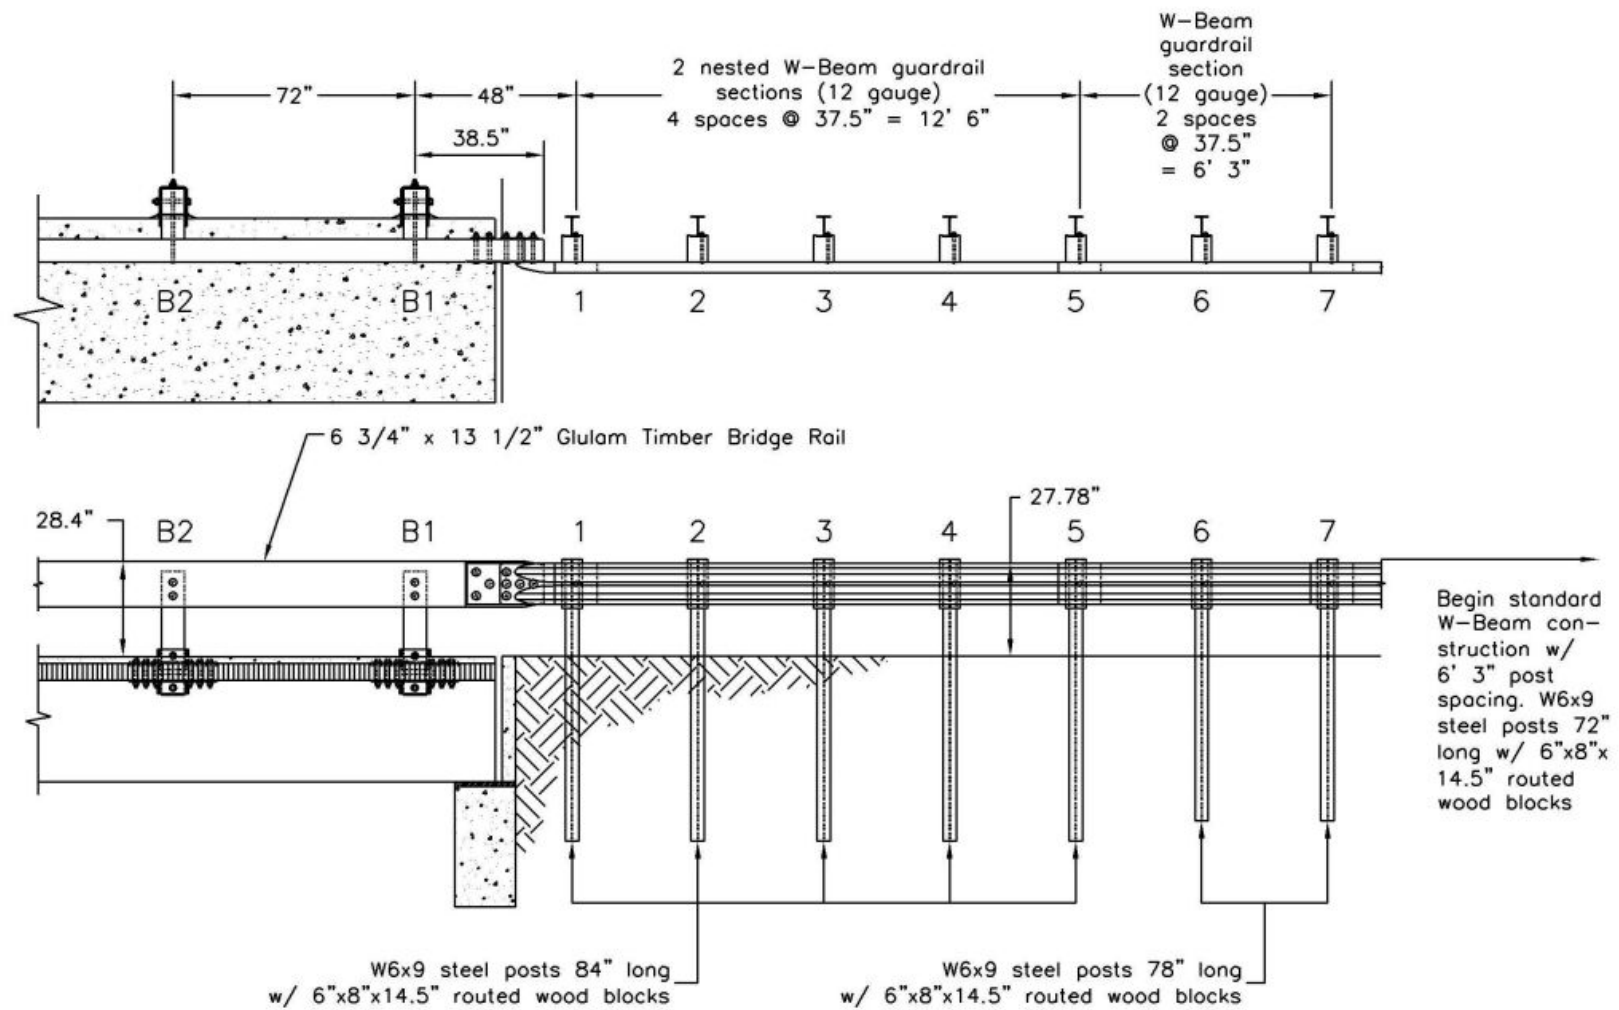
General Configuration of Approach Guardrail Transition System - Wood System
